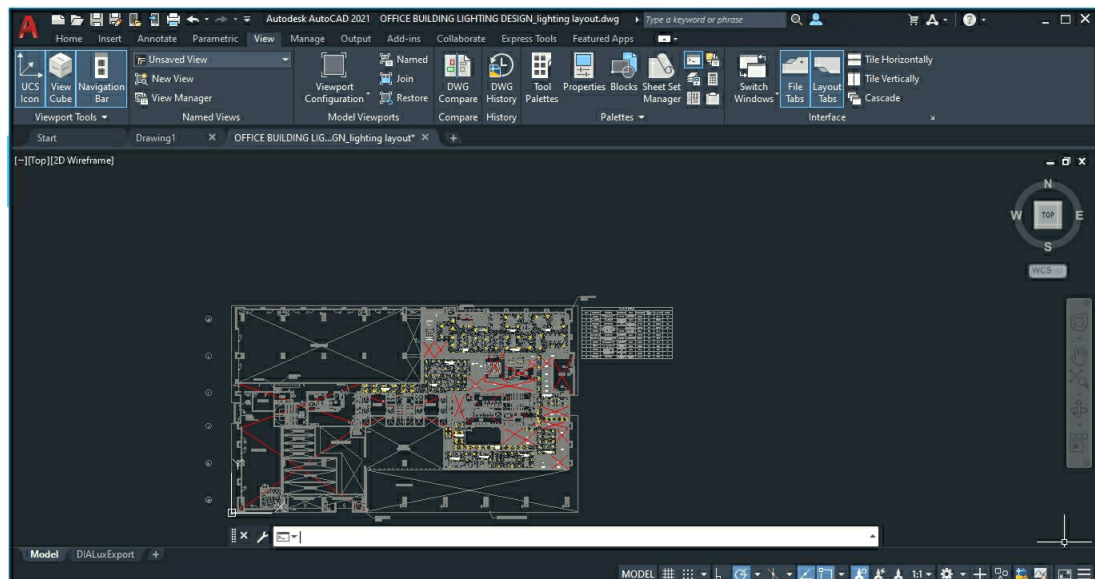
Opening the CAD drawing in AUTOCAD 2021
